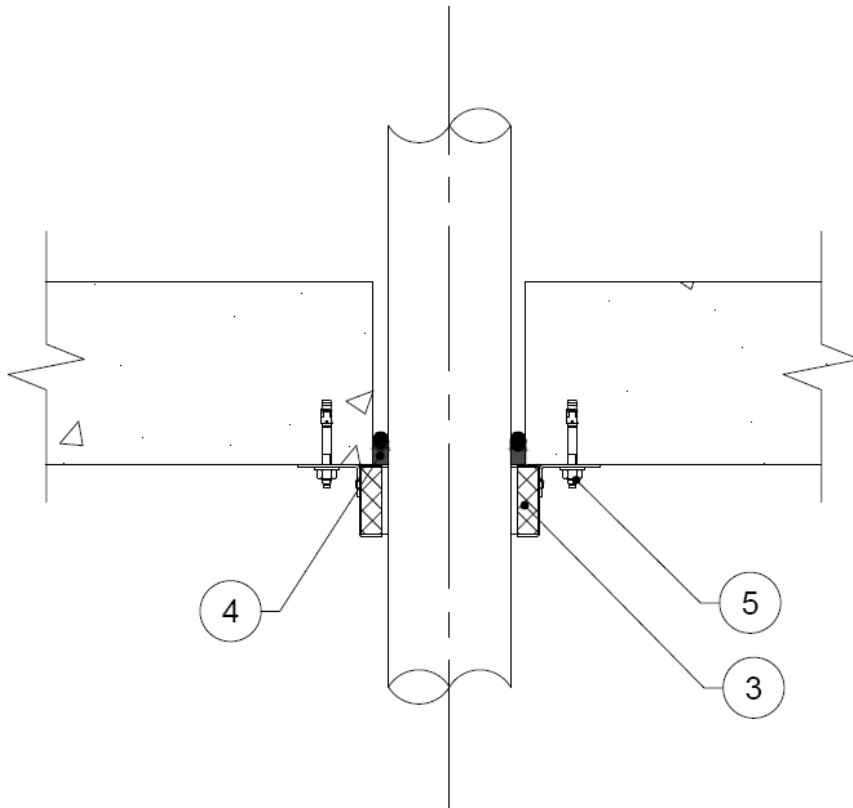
Sealant Detail around Uninsulated Pipes in concrete Floors
